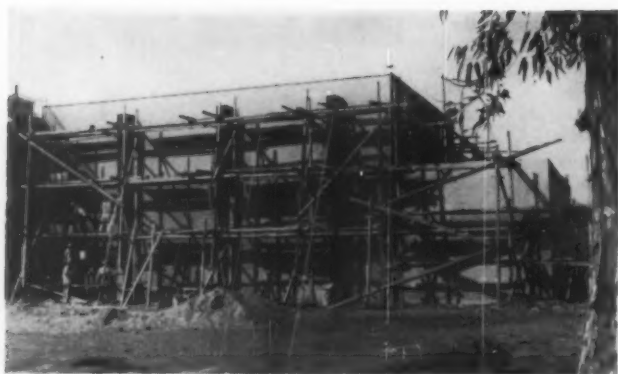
Exterior view of processing laboratory under construction in Cairo, Egypt.
